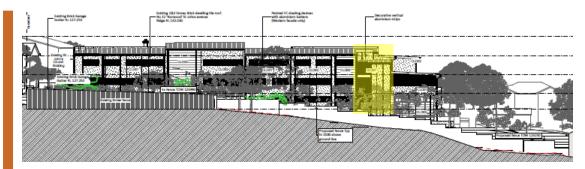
Proposed west elevation (Drawing No. DA-05.01 DA7)- yellow fill indicating the amended part
